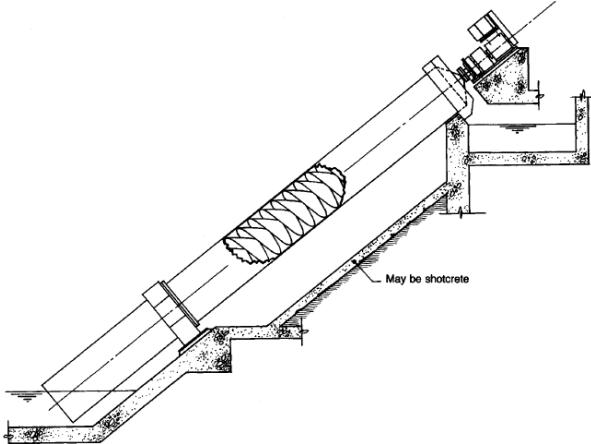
b) An enclosed screw pump, G.M. Jones [3].
